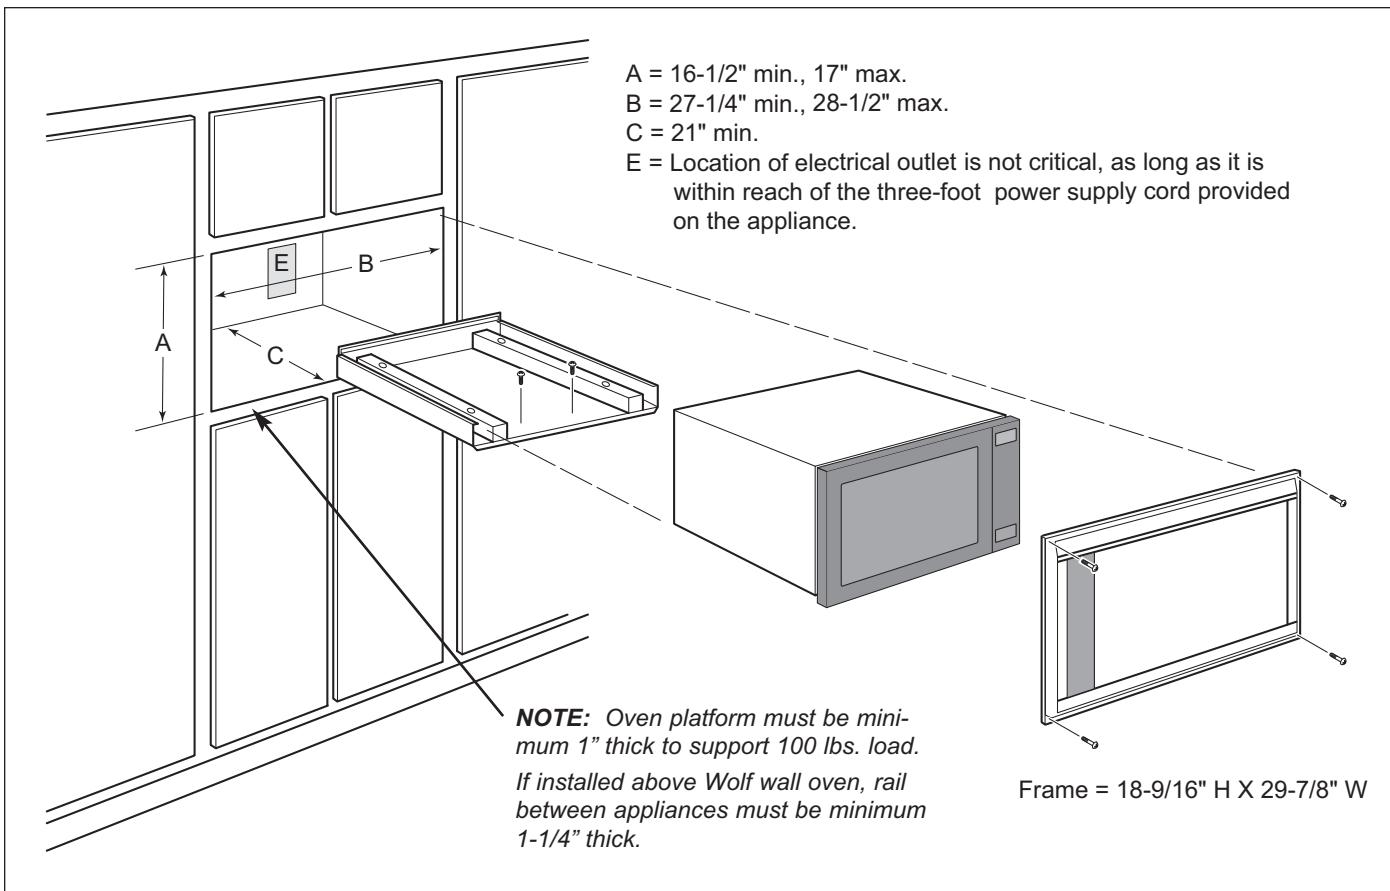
Rough-in Opening Dimensions and Trim Kit Installation
